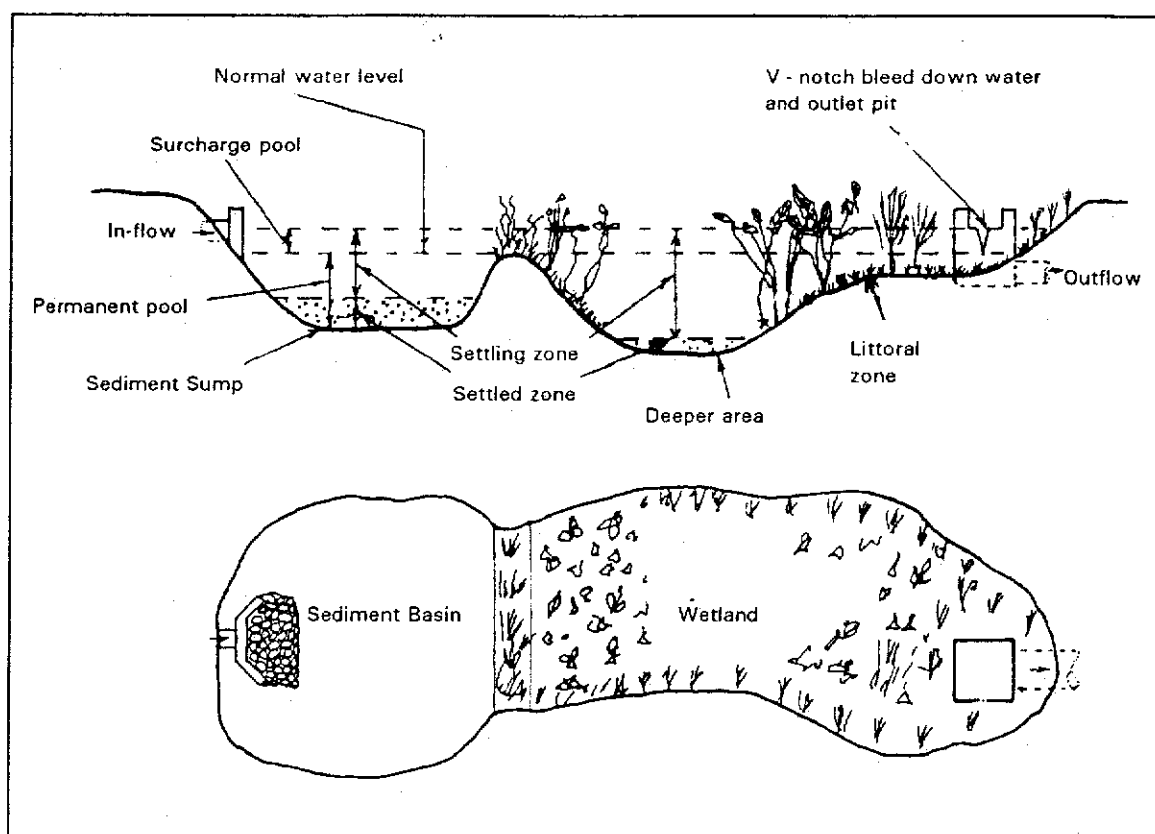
Sediment basin/constructed wetlands - typical series configuration (adapted from Livingston *et al*, 1988); plan and longitudinal sections
